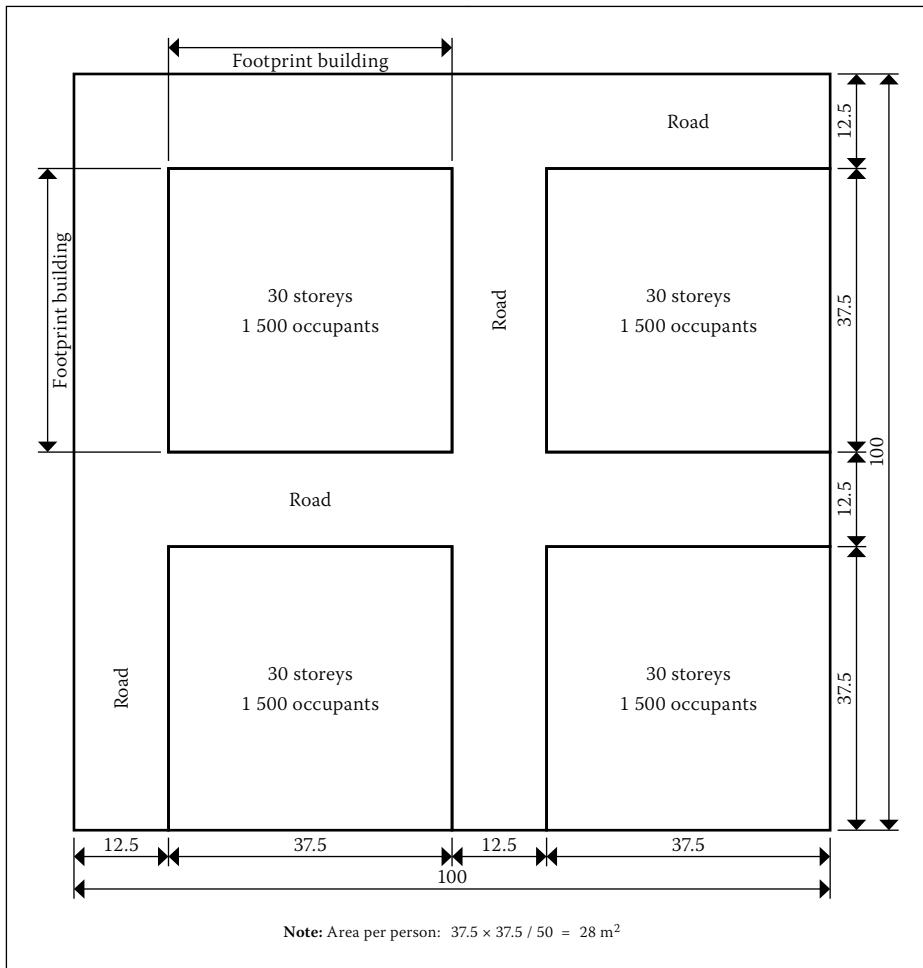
Typical layout of multi-storey residential buildings in a city centre
